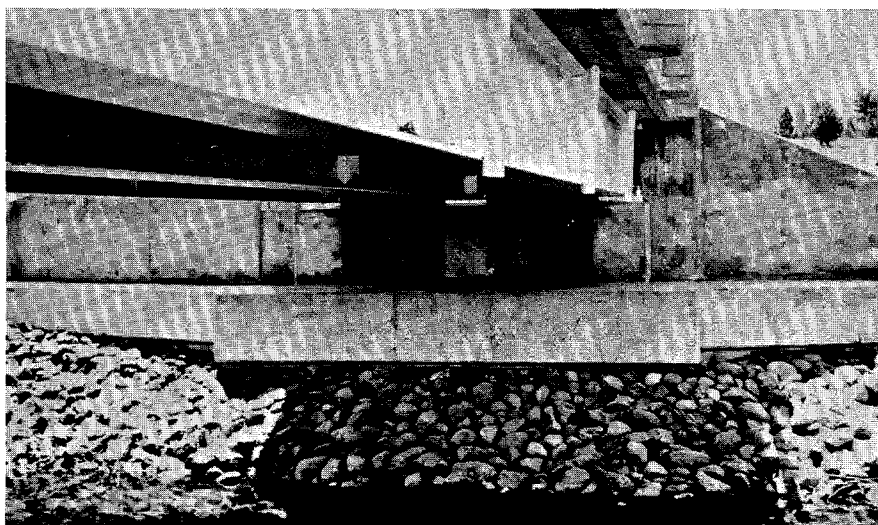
View of left-bank abutment with cobble riprap bank protection placed in 1954. (From U.S. Forest Service.)
